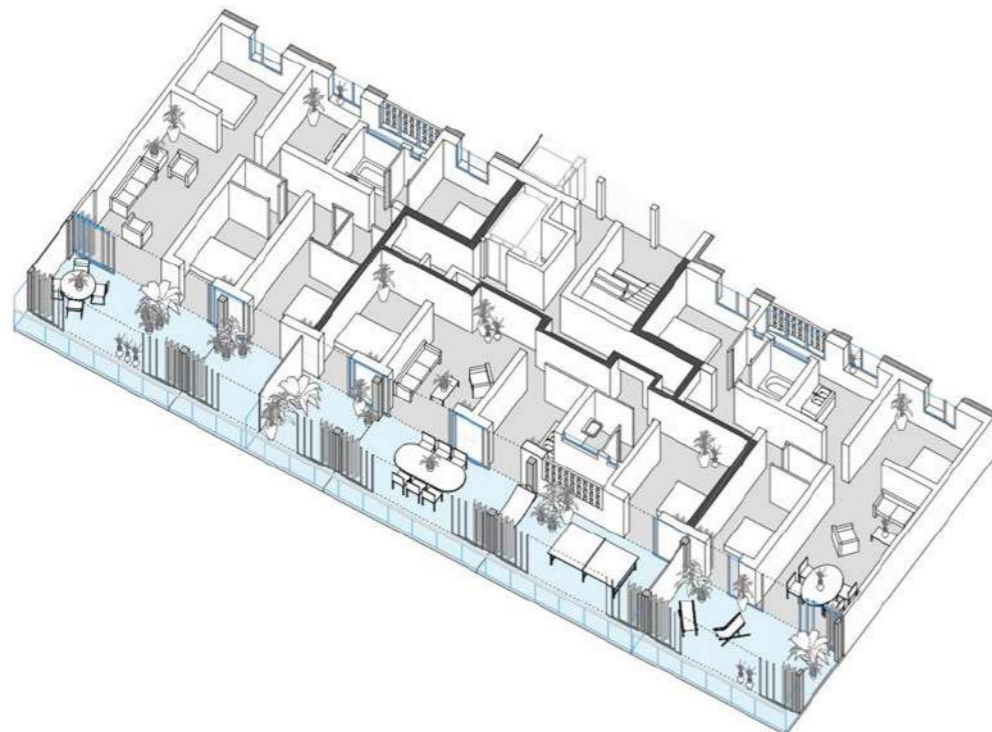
Transformation Project, buildings H & I new Floor Plan. © Lacaton&Vassal.
